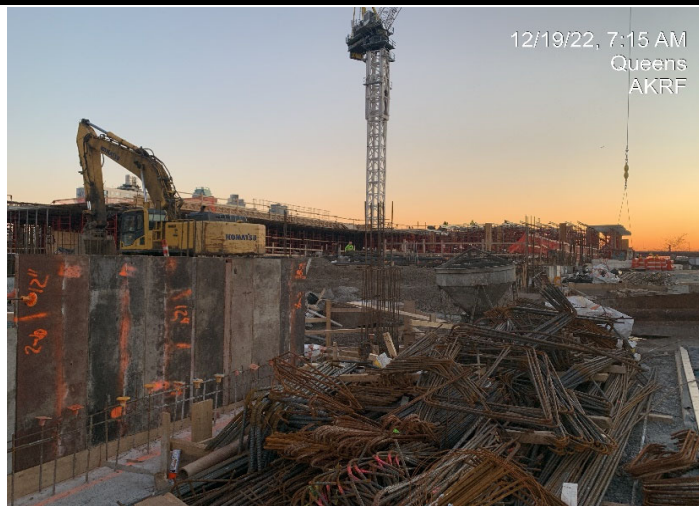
CCJV installing SSDS piping in WC-10, view facing northwest.
